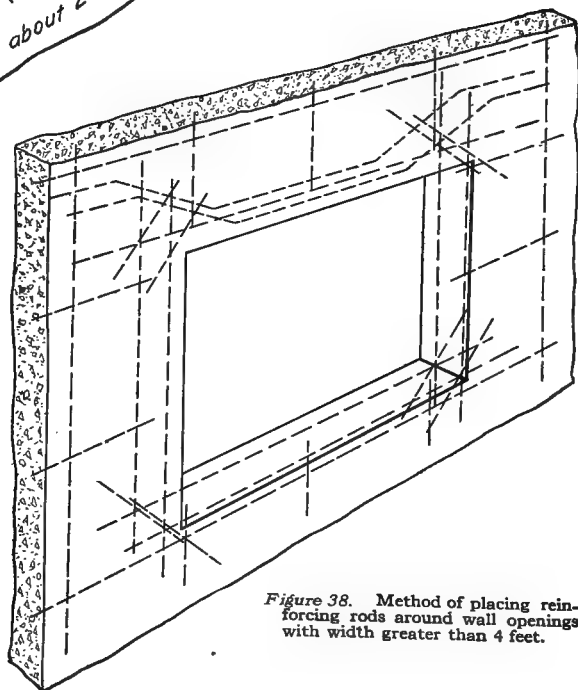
Method of placing reinforcing rods around wall openings with width greater than 4 feet.
